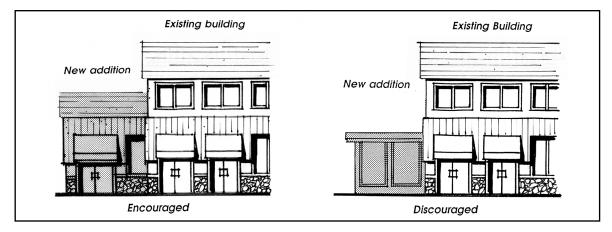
COMPATIBLE DESIGN IN BUILDING ADDITIONS
